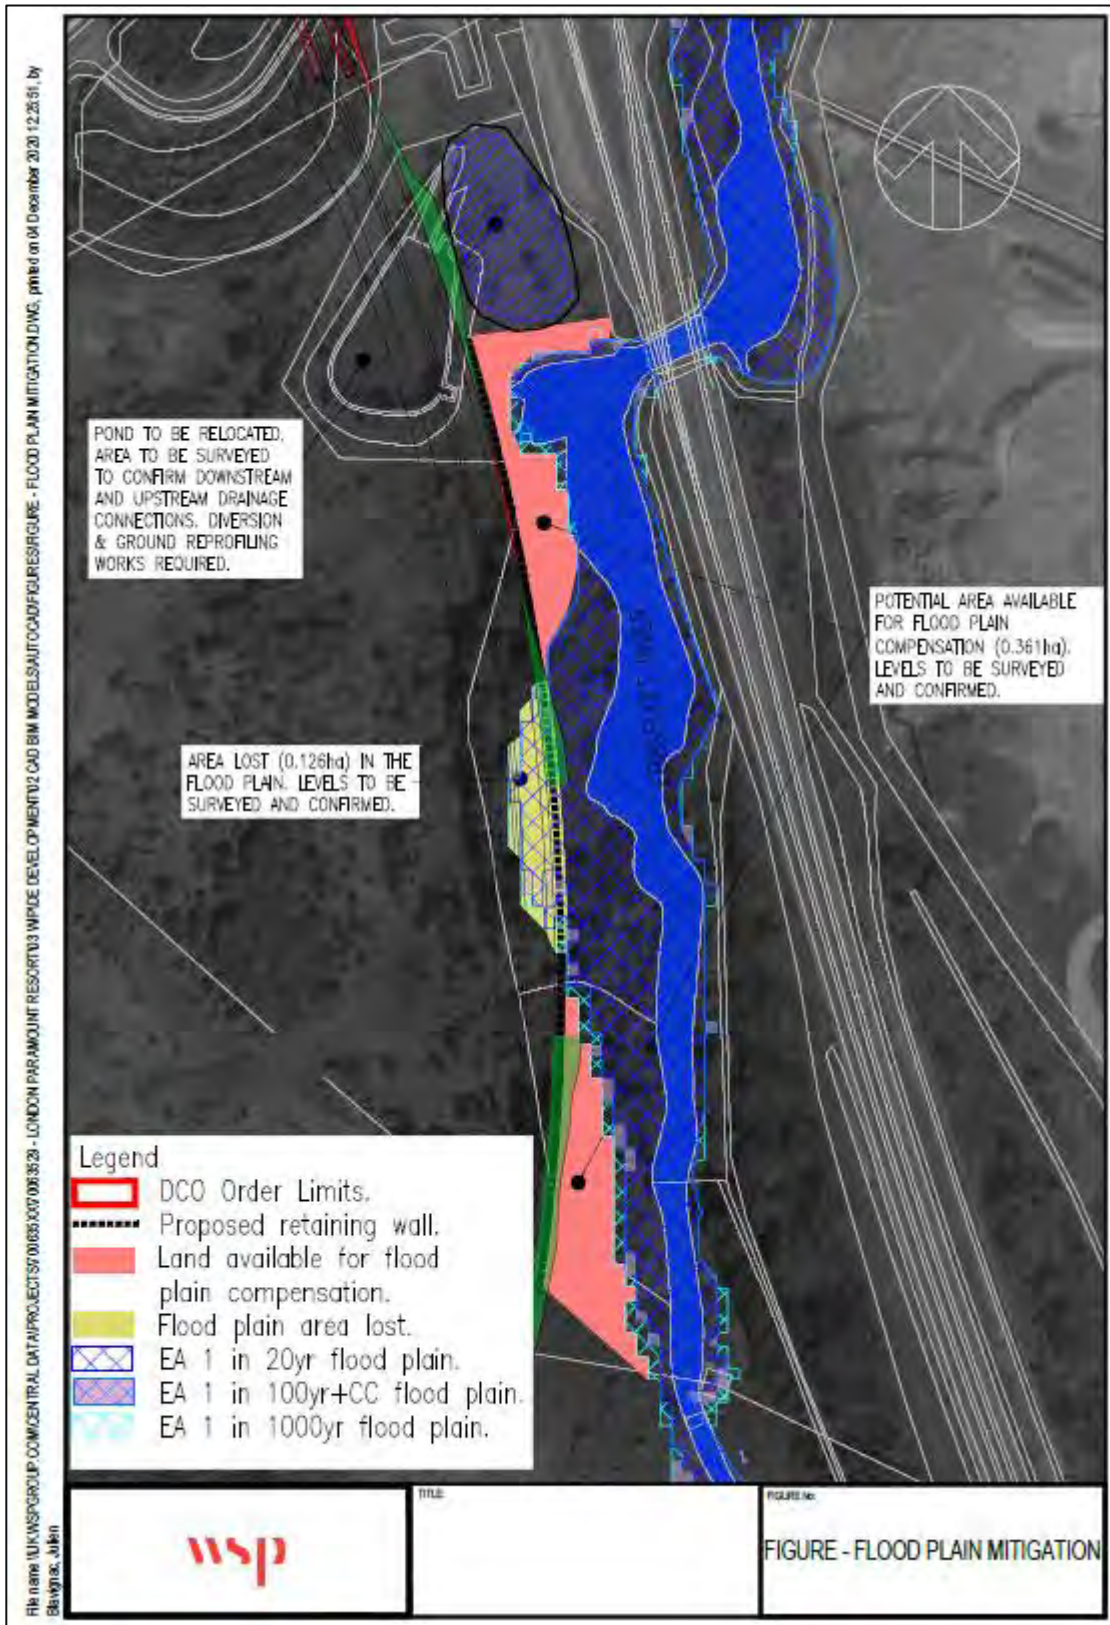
London Resort Kent Project Site (Access Road) fluvial flood plain mitigation
